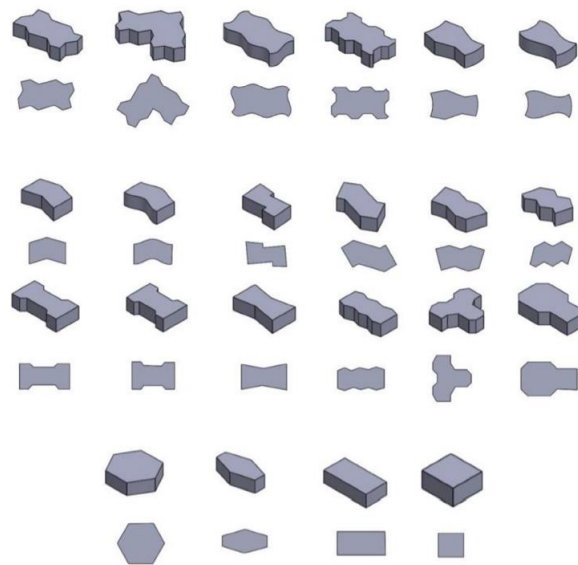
Shapes of the concrete pavers (Jamshidi et al., 2019)
